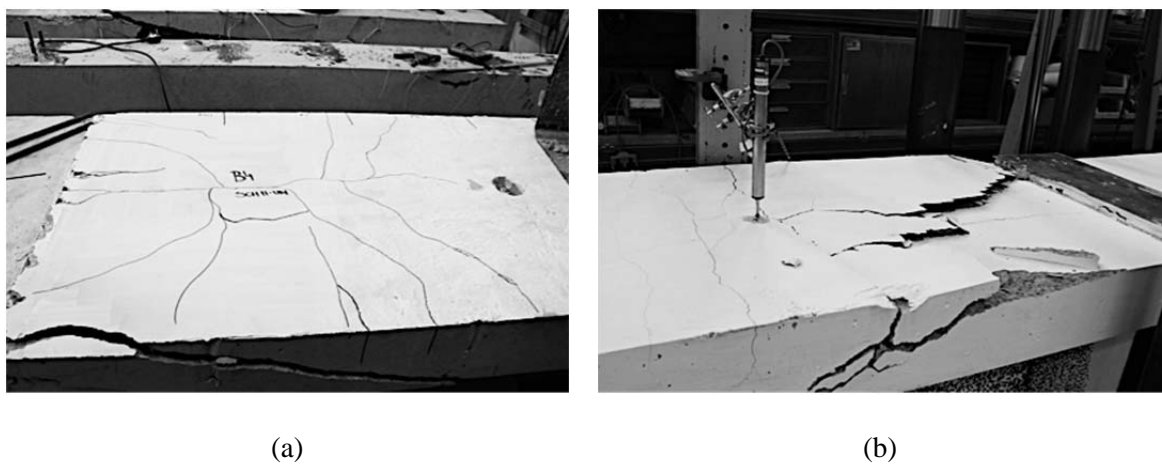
Slab failure modes in U-wrap systems: (a) specimen LB1U, (b) specimen LB2UA.
